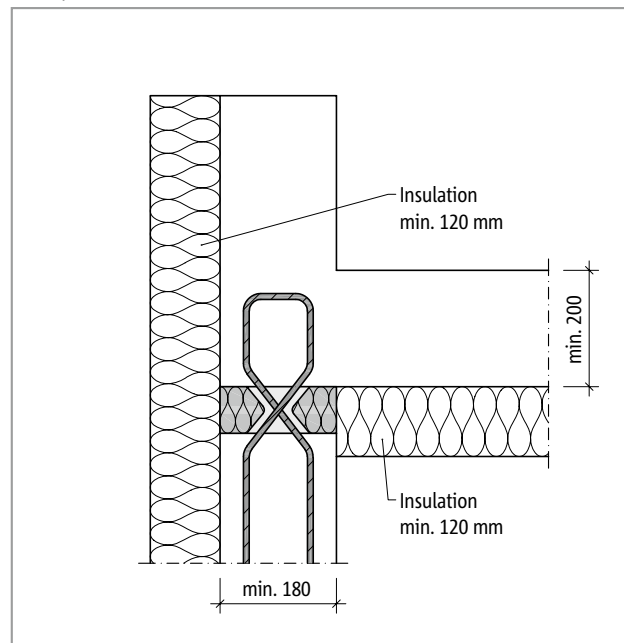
Schöck Sconnex® type W: R 30 / EI 0 with external wall and under-slab insulation without fire protection measures
